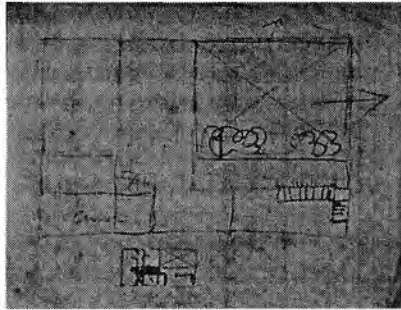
Le Corbusier. developed floor plan of the villa Stein, October 1926.
